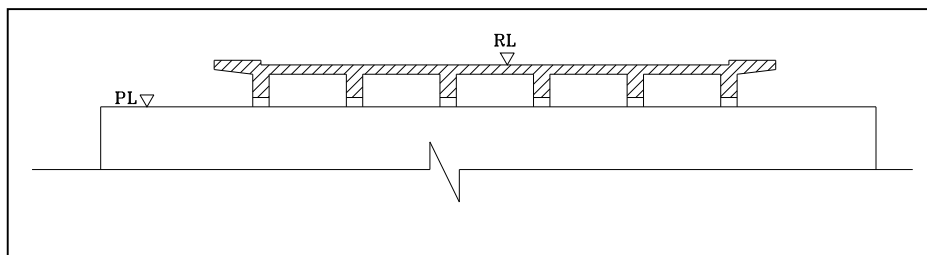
Cross section of Bridge type No.3 (Beam type)
